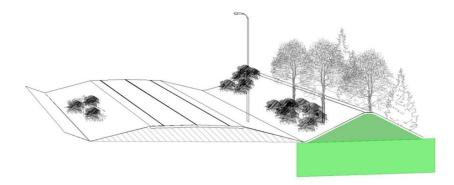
Noise barrier where the subgrade is reinforced with mass stabilization and the stabilized mass is used as material in the wall embankment
